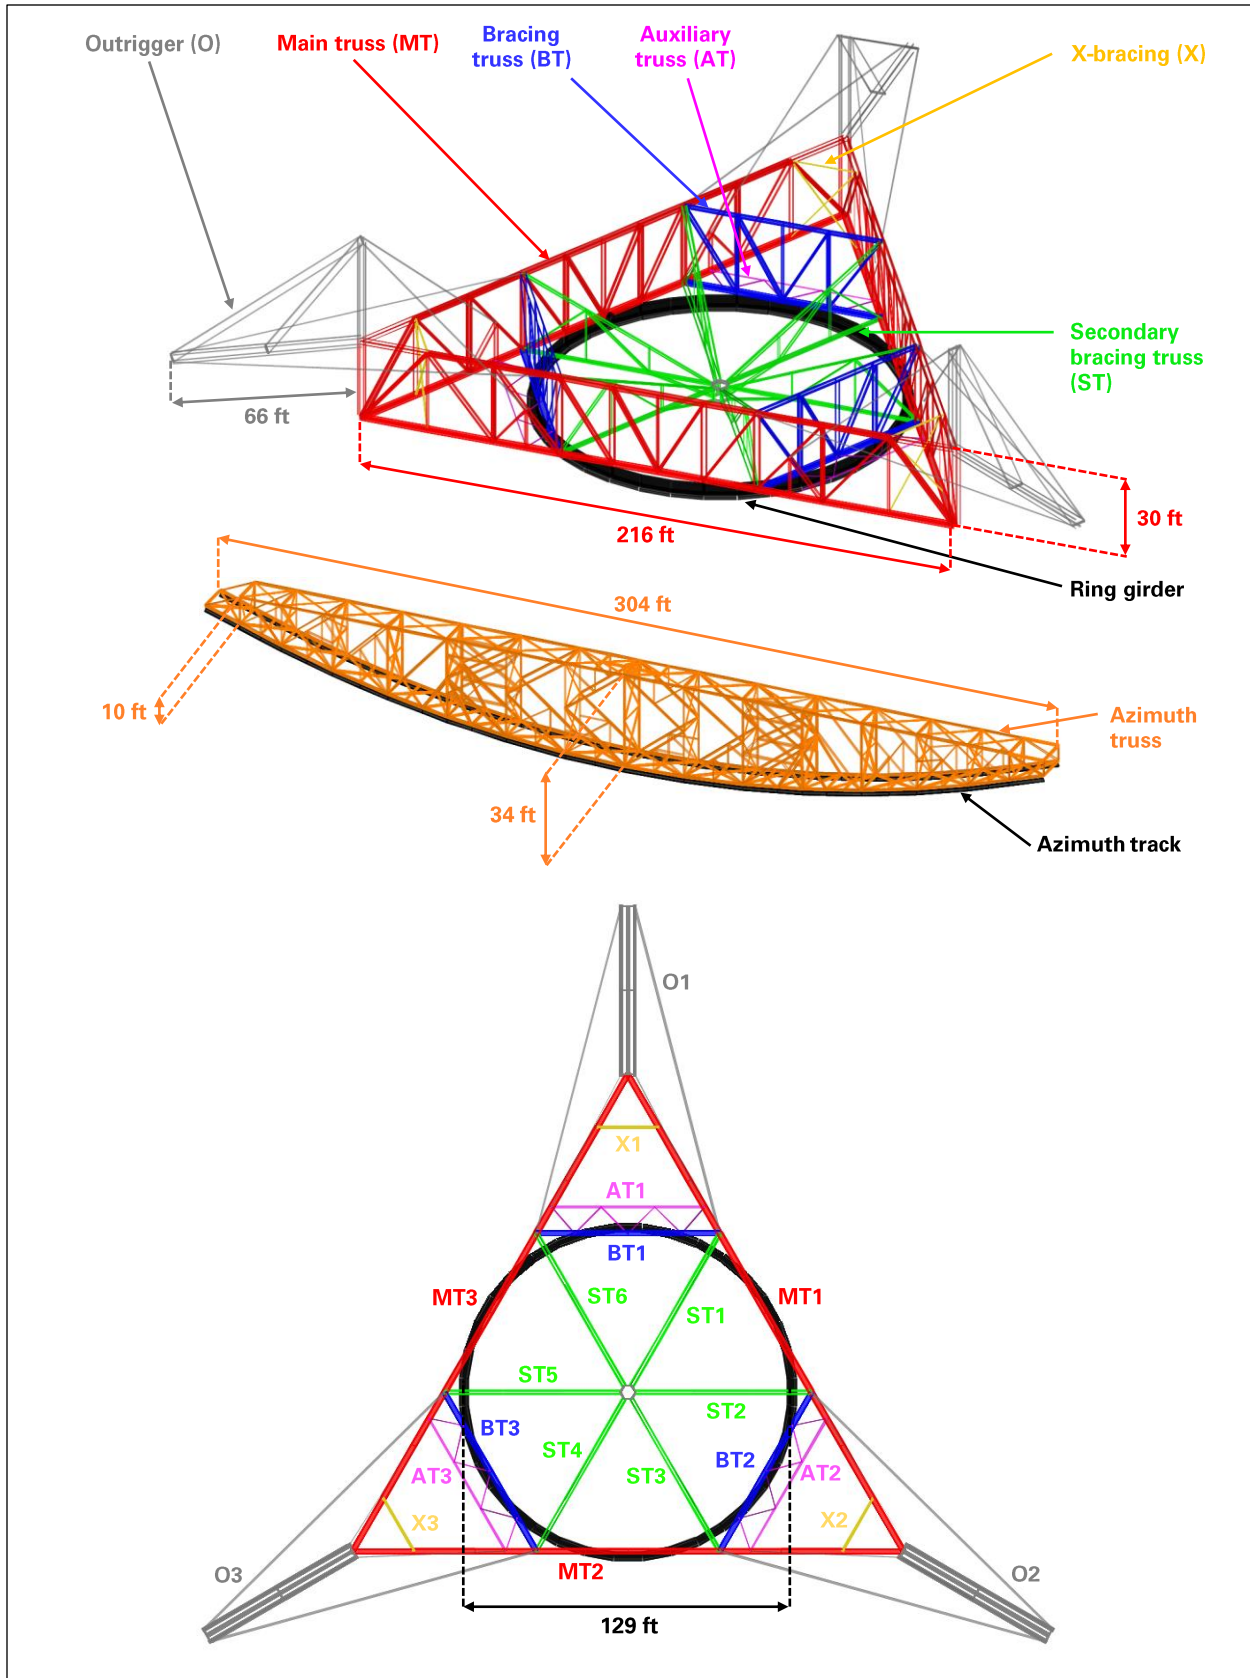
Truss nomenclature and dimensions of upgraded suspended structure.
